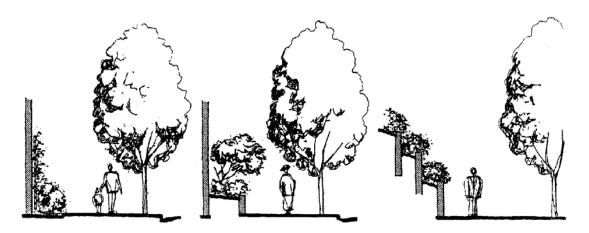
Blank walls can be softened and provide interest and human scale in several ways. This shows use of landscaping for visual relief.
